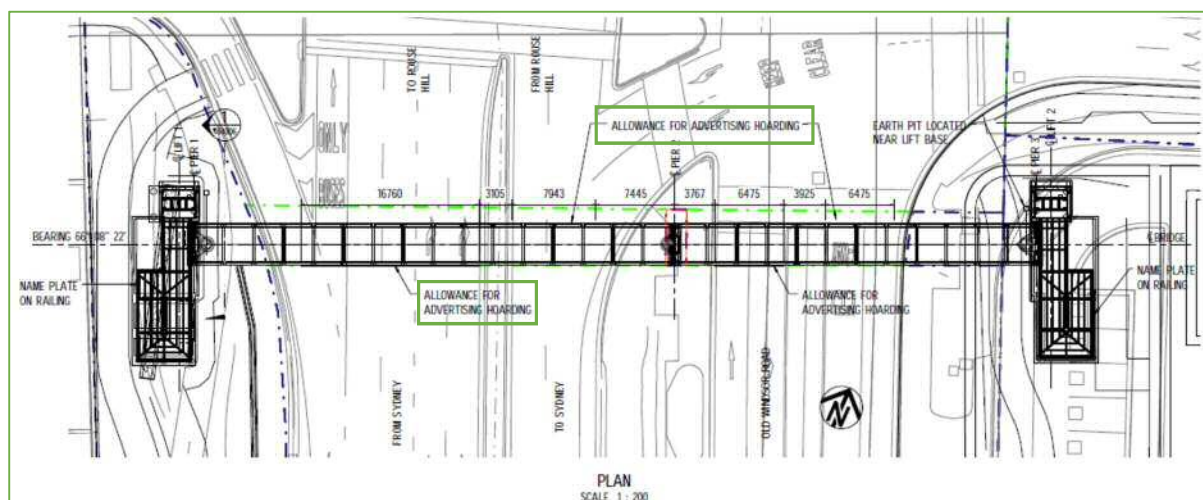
Extract of TfNSW approved construction plans highlighting provision for Advertising Signs
